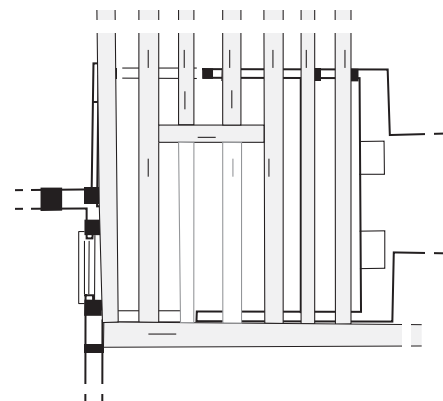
Floor plan of room 24 (floorboards removed, ground floor ceiling beams and joists visible). Note framed and chamfered opening, probably for original principal stair. (The grey-coloured joists tenoned into the trimmer are later insertions).
